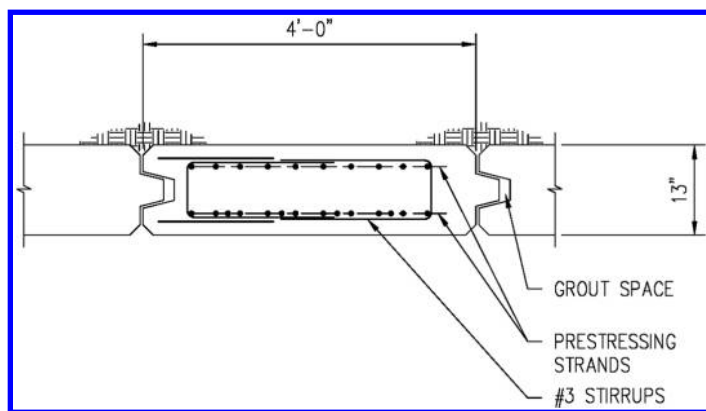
Plan section of a prestressed concrete sheet pile with tongue-and-groove joints—a common pathway for soil migration
